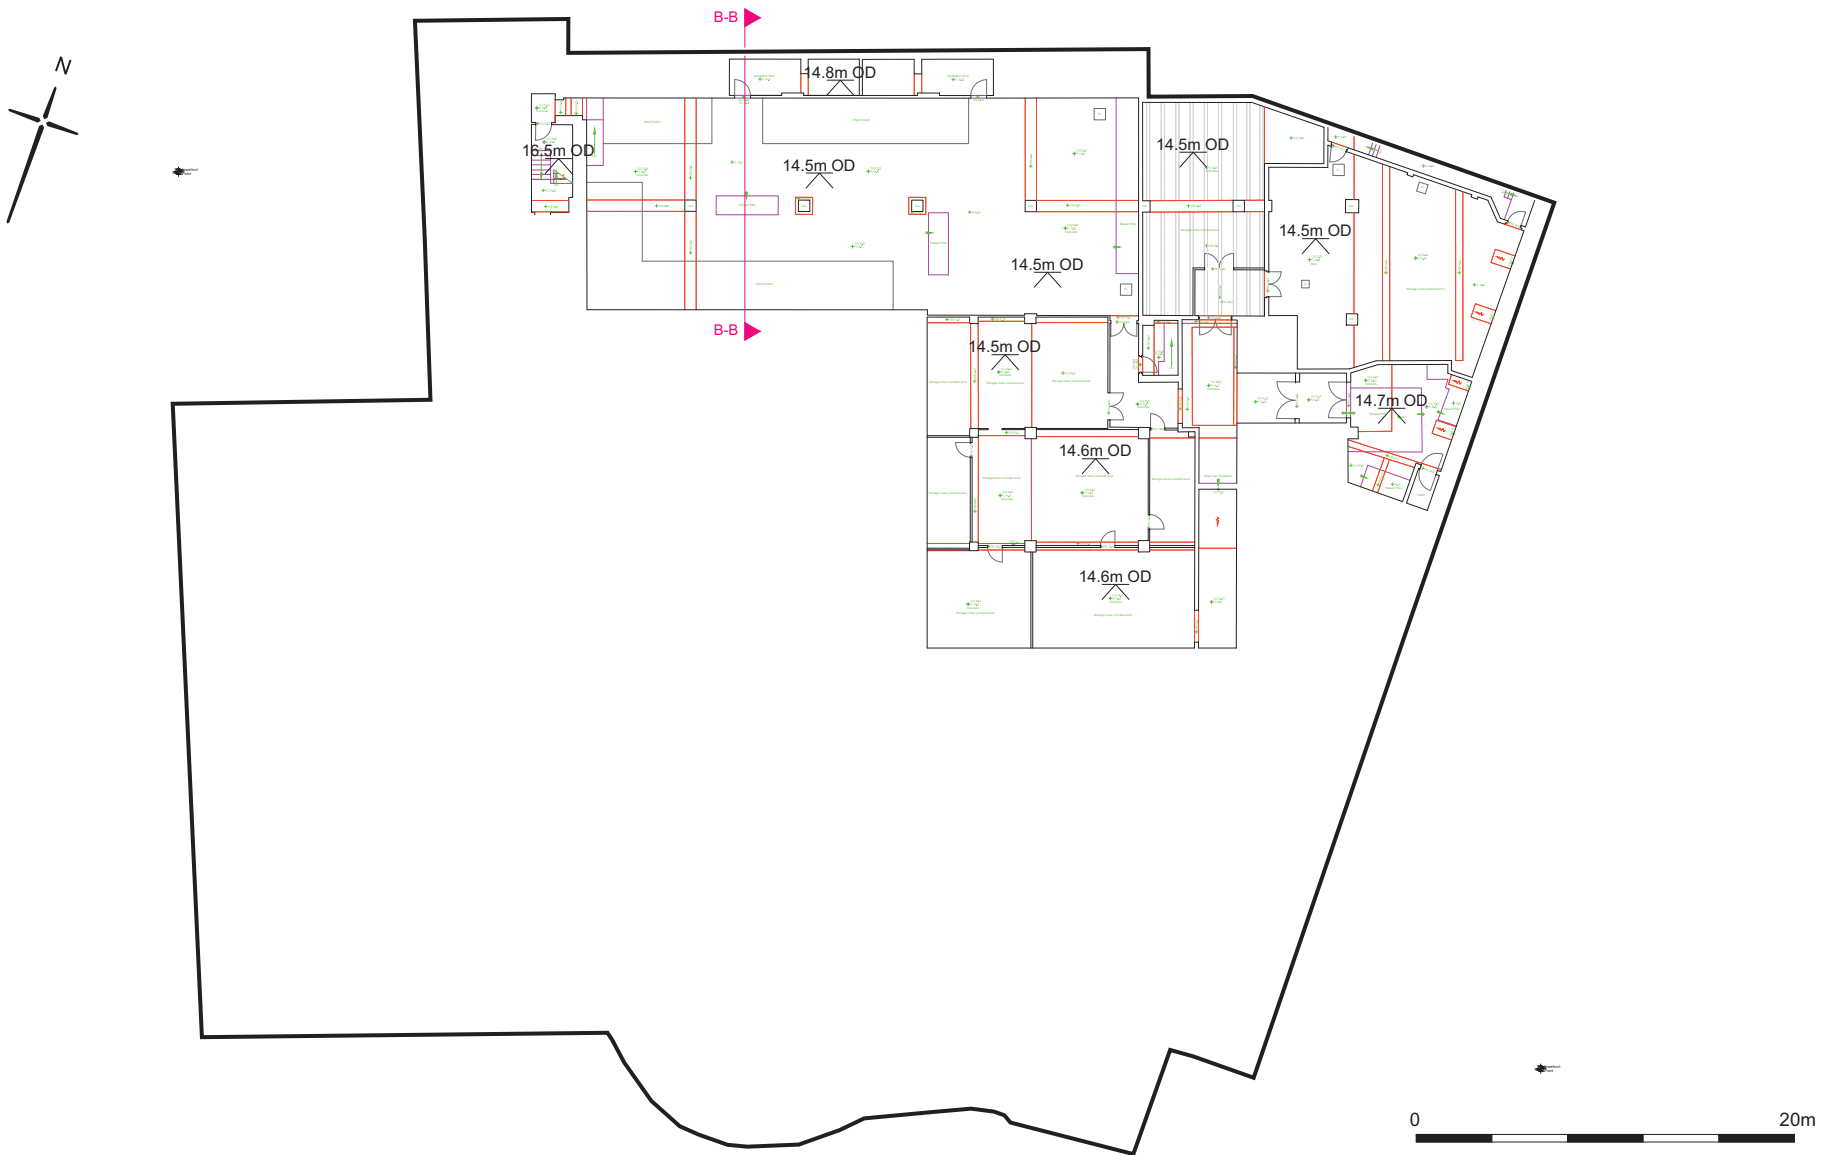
Plan of existing sub-basement (Omega Geomatics, dwg no. 1/10, April 2011)
